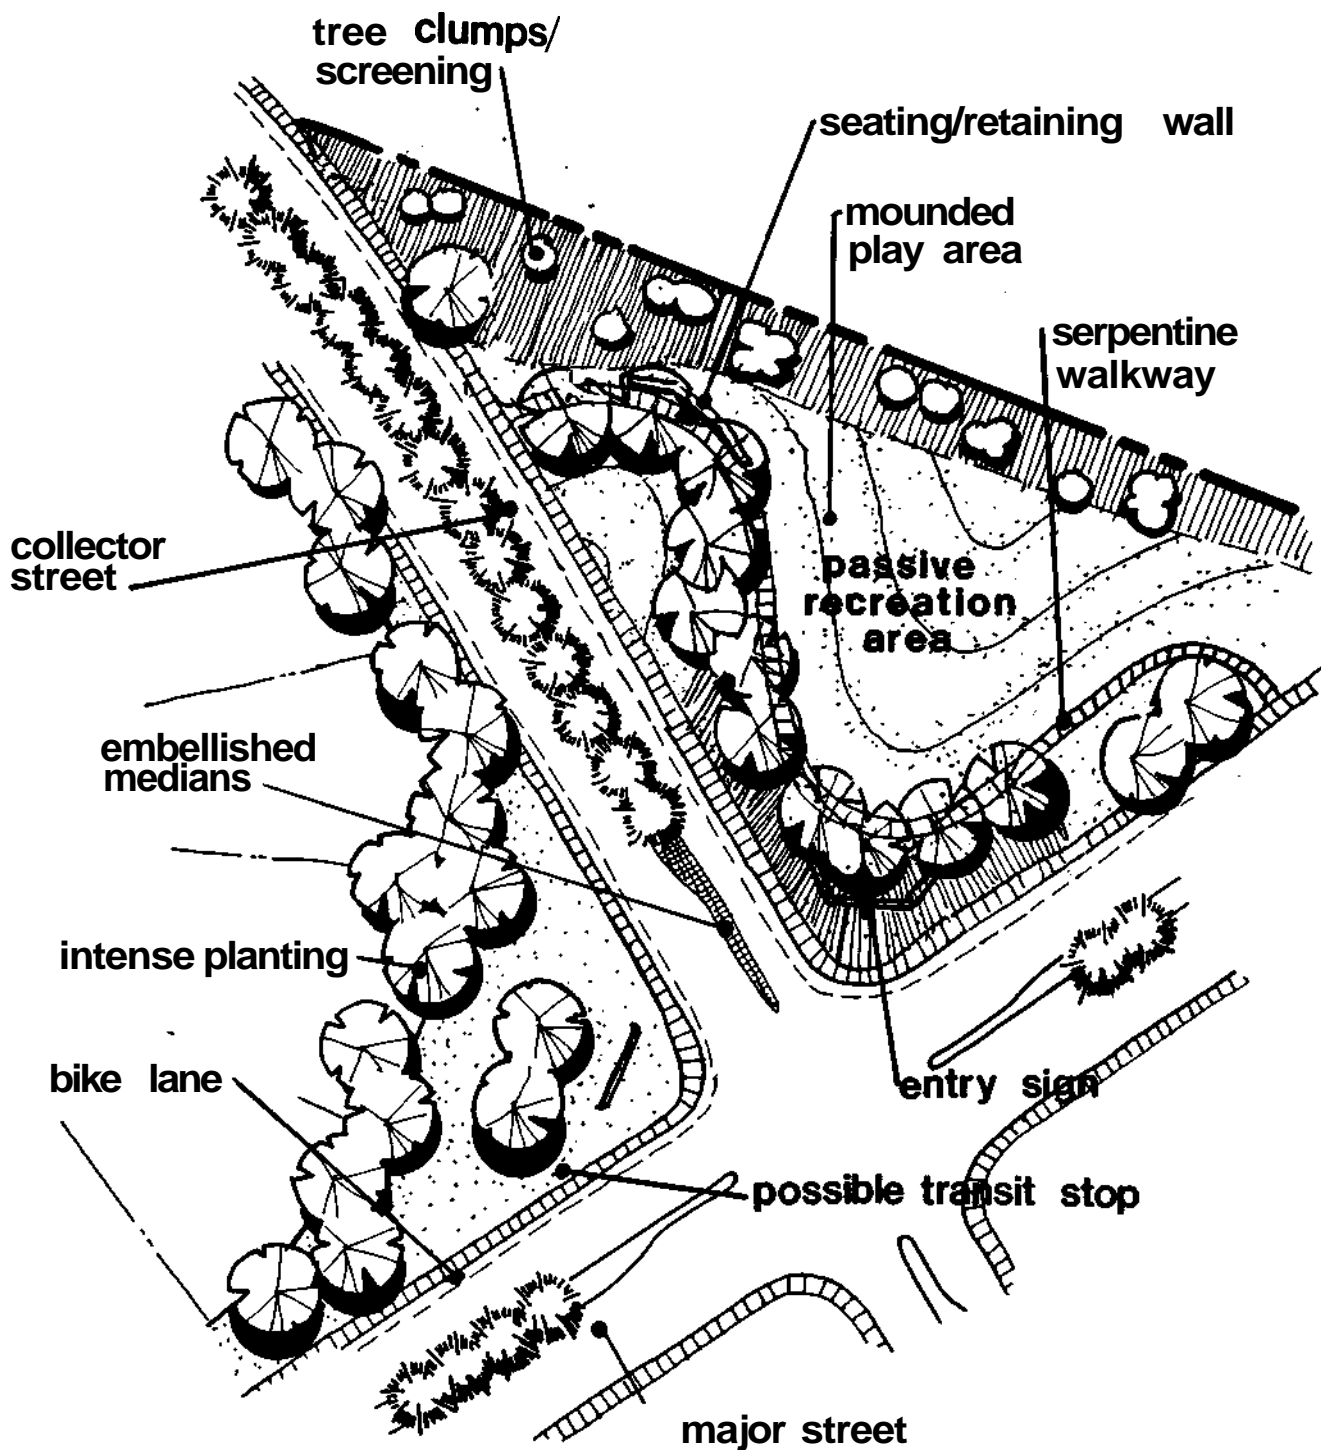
illustrates the typical design treatment of Del Mar Heights Road. Adjacent projects should be coordinated with the major street parkways to maintain visual continuity. Plantings should be concentrated adjacent to Del Mar Heights Road - generally at the bottom of the slope.
